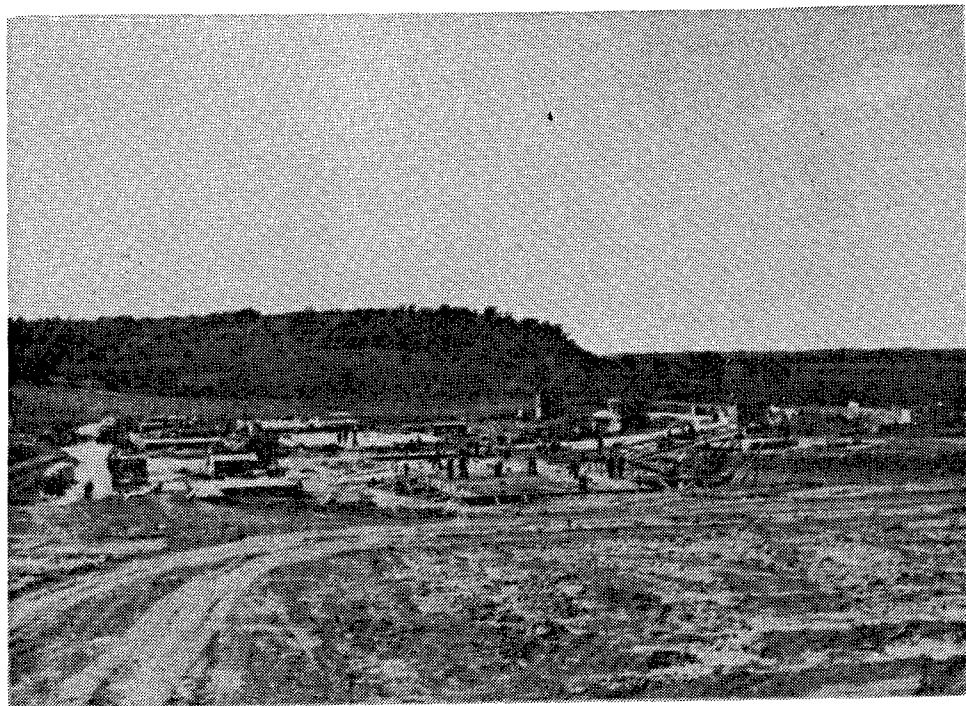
Overview of LCOP Tracer Manufacturing area construction, ca. 1941 (original photograph on file, LCAAP).
